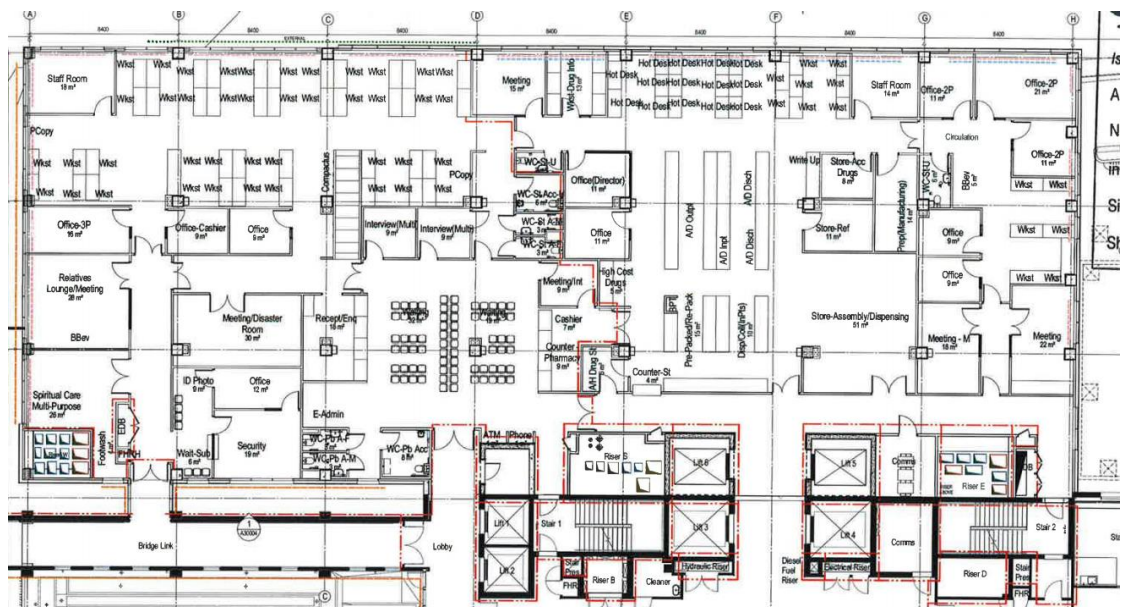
Approved Level 04 Floor Plan (Source: Woods Bagot)
